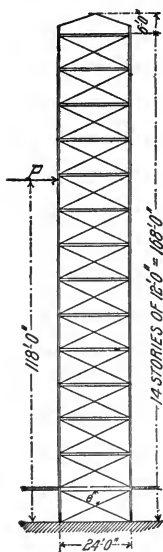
Figure showing Typical Sway-rod Bracing.
